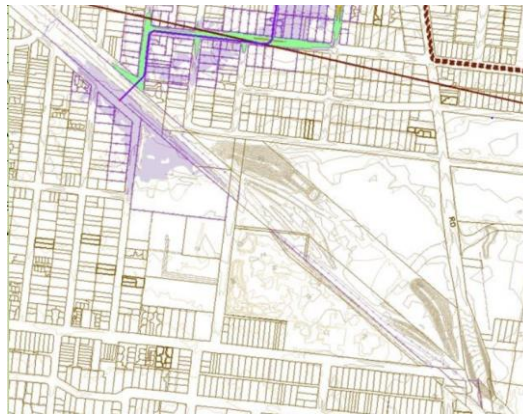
Melbourne Water Stormwater Asset Plan (2017)
